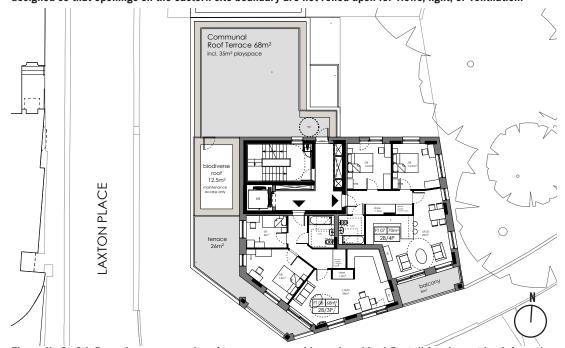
6th floor plan; communal roof terrace proposed is enclosed by 1.5m tall fencing set back from the roof parapet to mitigate overlooking down onto neighbouring outside spaces.
